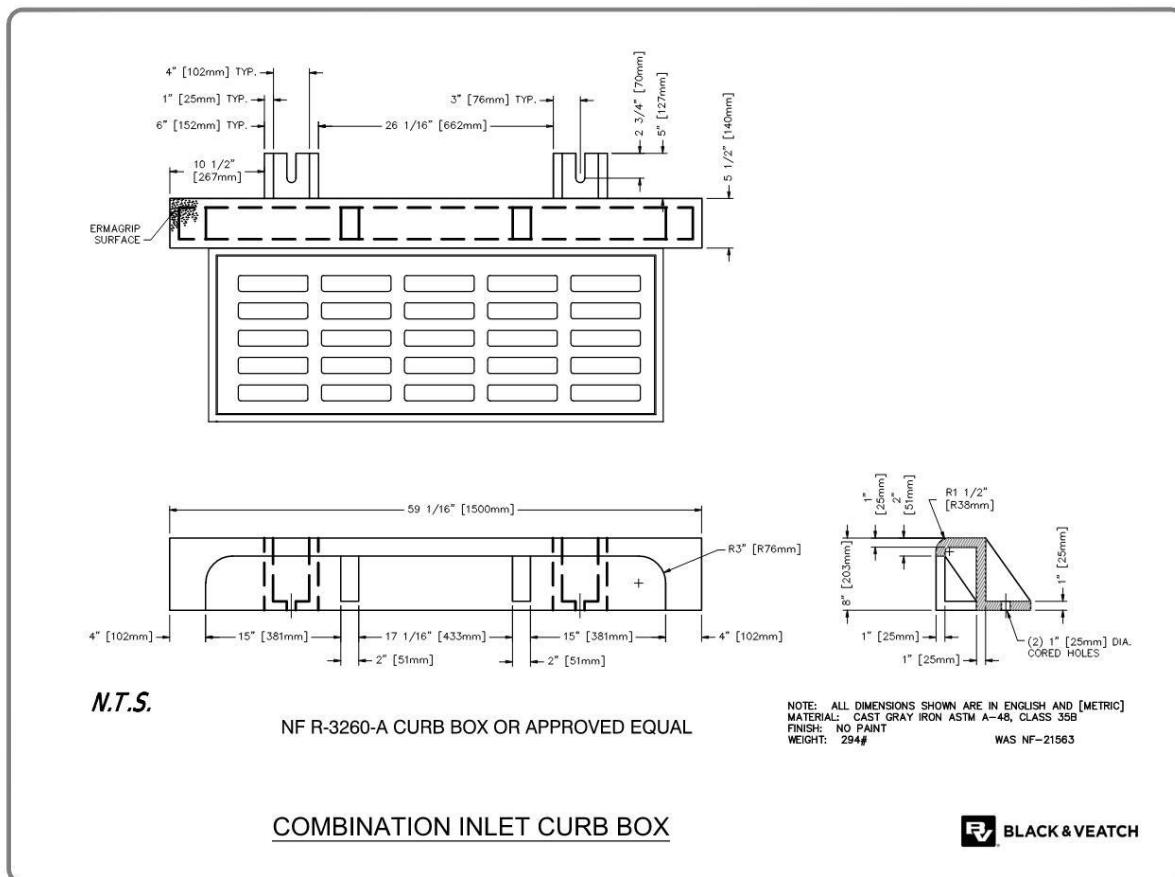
Standard Detail Depicting a Stormwater Inlet Curb Box
